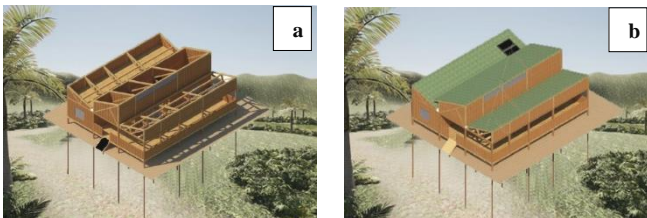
Axonometry floor plan one walls and zenithal illumination (a). Proposed axonometry (b).
